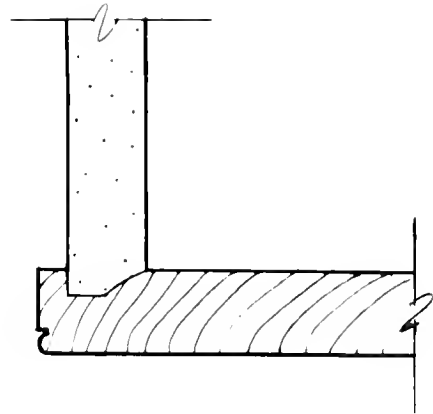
Wall Section This section is taken through the window head and shows how it is profiled to receive the plaster.
